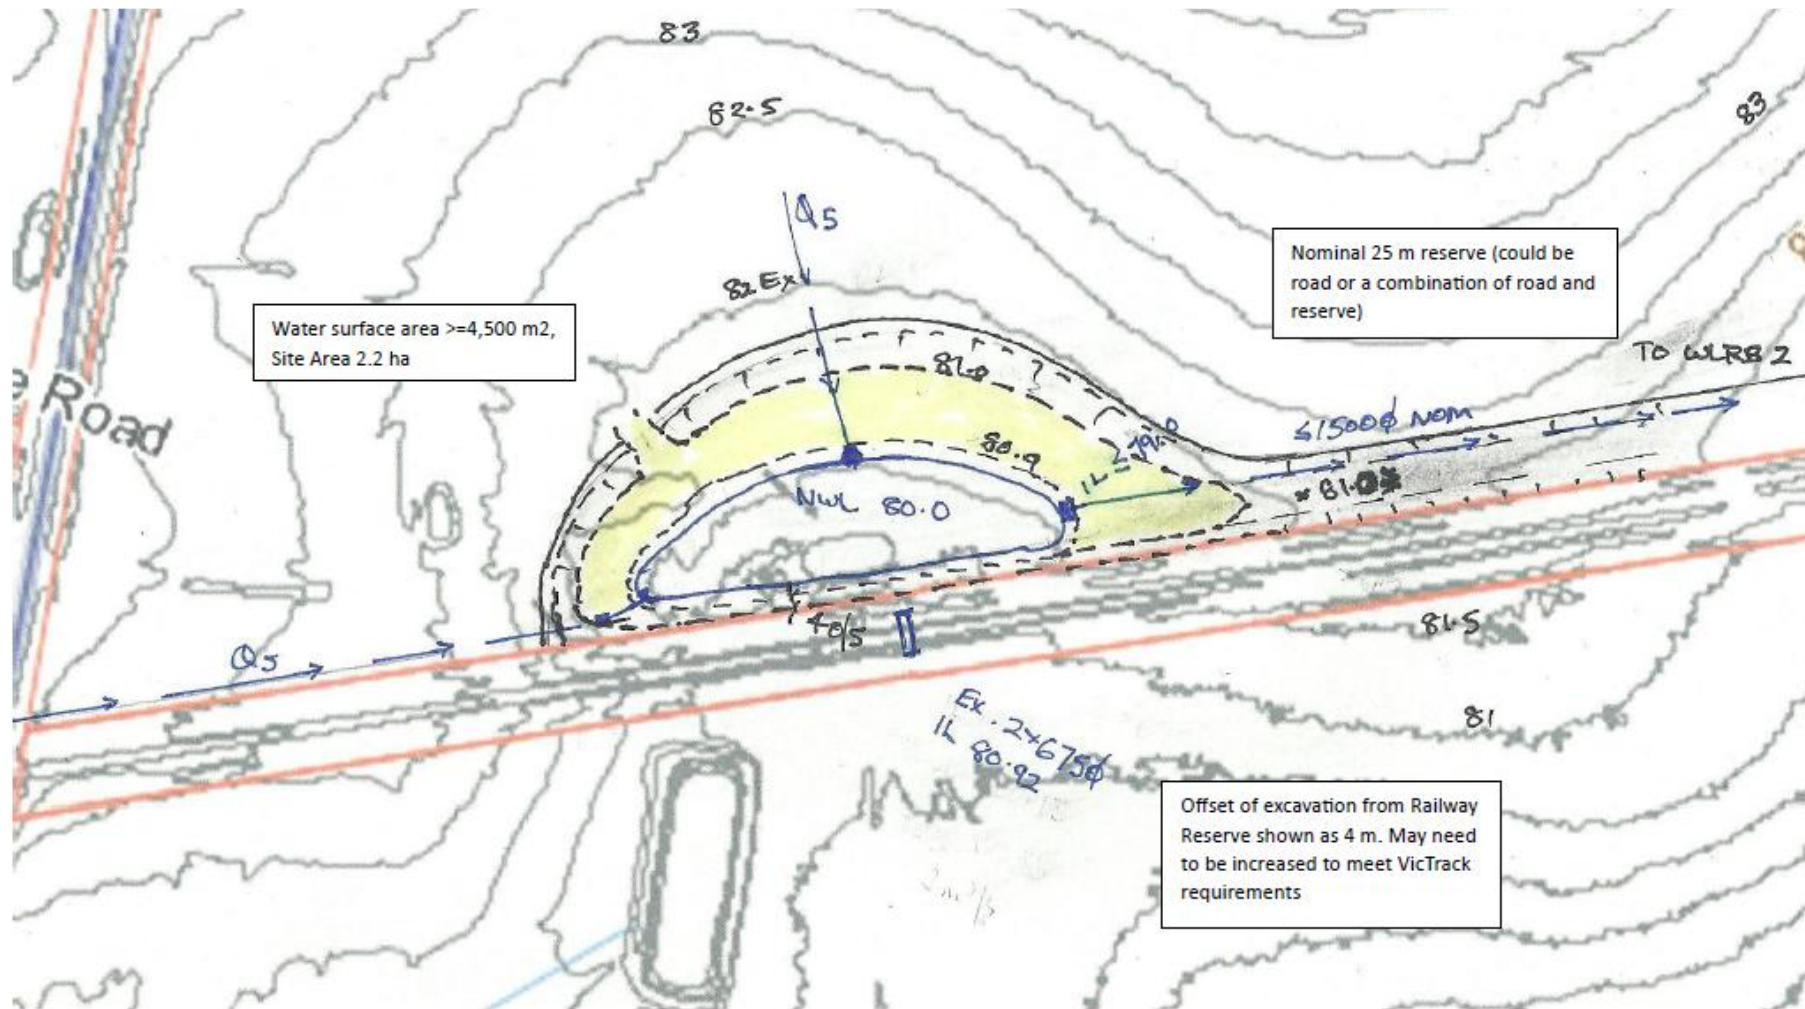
Suggested Alternative SWMS Layout (see Figs 3-6 for details)
